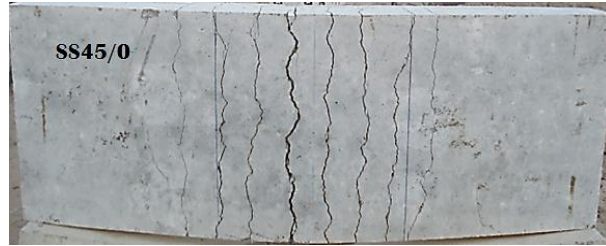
Cracks pattern at the tension face of the specimen SS45/0 after failure.
